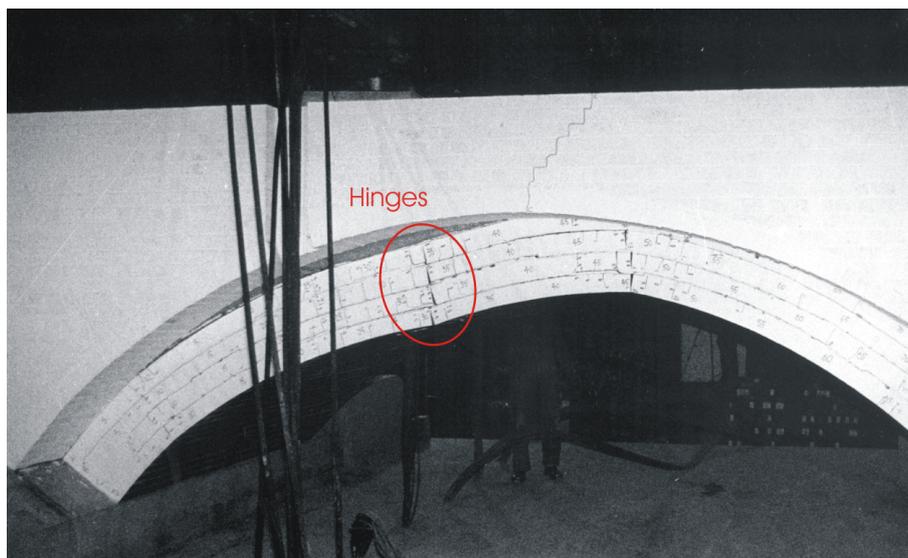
Bolton bridge 5-2 containing debonded rings approaching collapse (note the diffused hinges under the load)
